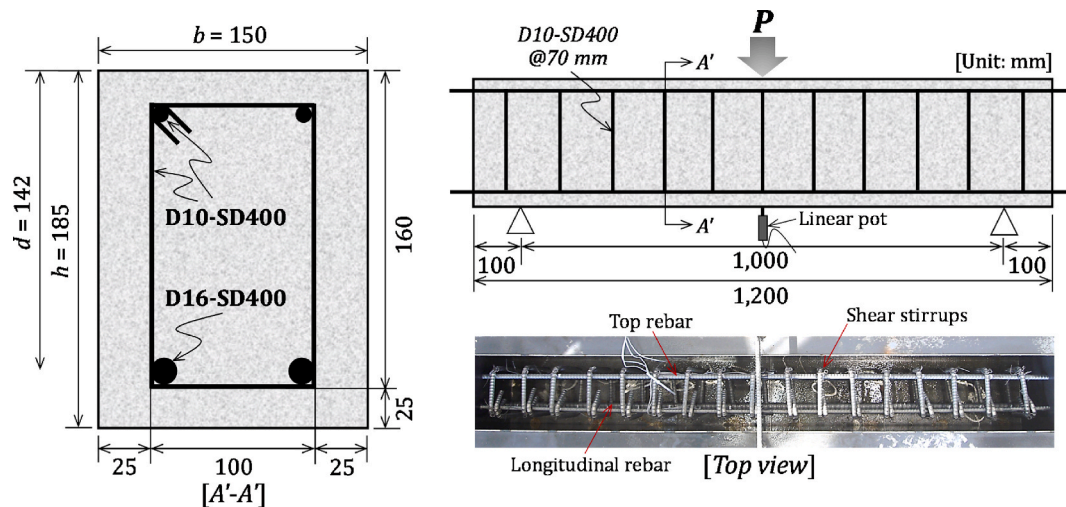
Cross-sectional and reinforcement details of reinforced UHPC and UHPFRC beams.
